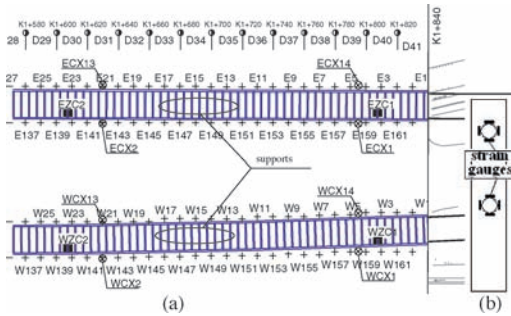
General layout of monitoring points: (a) The south section of the excavations; (b) The strain gauges welded around the support.
